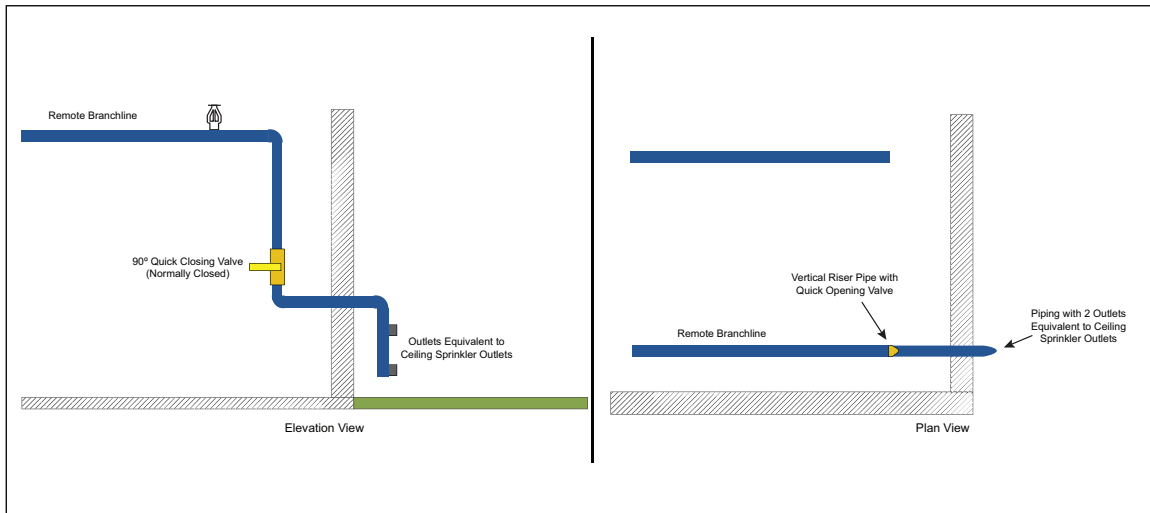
Example arrangement of an inspector's test connection for a dry sprinkler system design using 2 sprinklers on the most remote branchline
